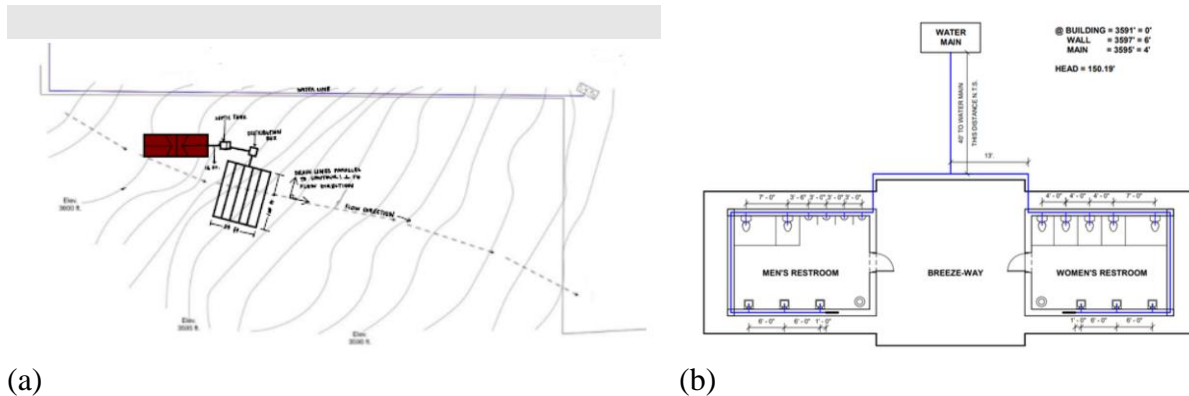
(a) Design layout of the sewage system (b) layout of the water distribution system, at Buff Trails
